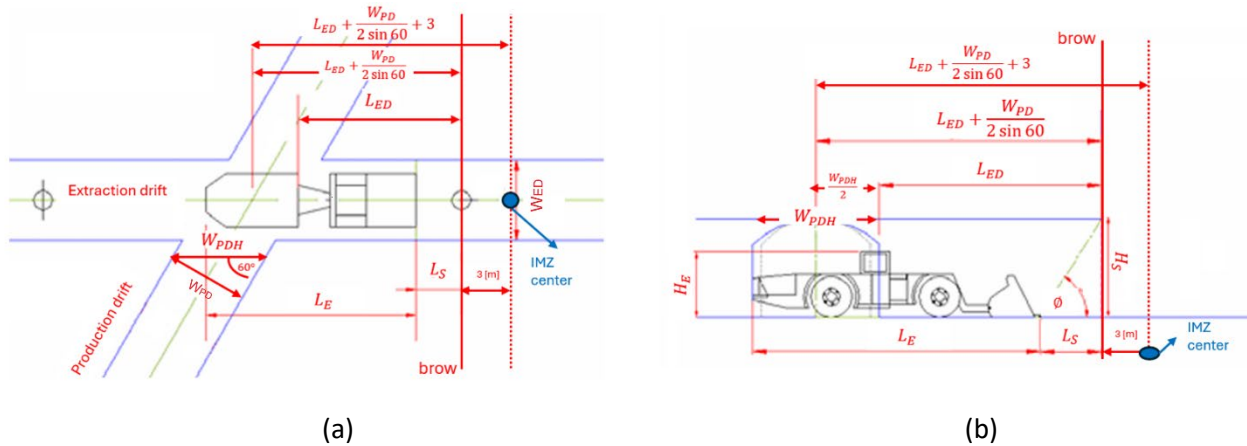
Geometries considered for defining extraction level distances, including equipment dimensions. (a) Plan view; (b) Profile view
